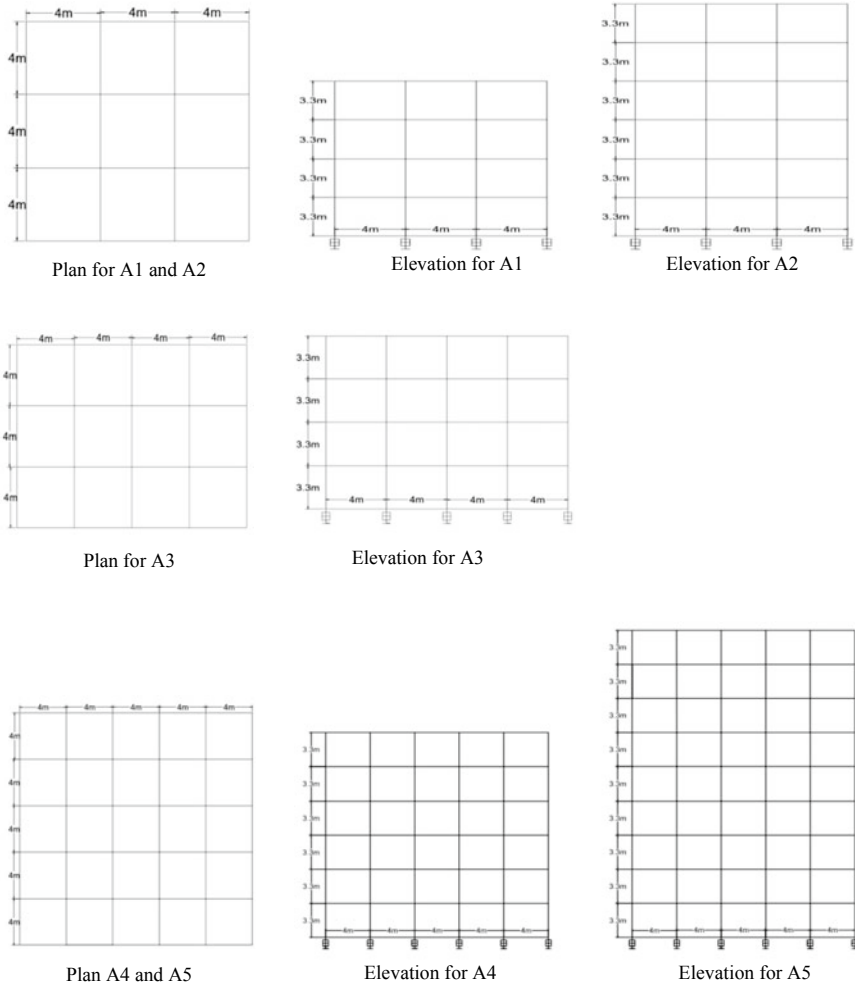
Building plan and elevation for all the model, namely. Model A1, A2, A3, A4 and A5
